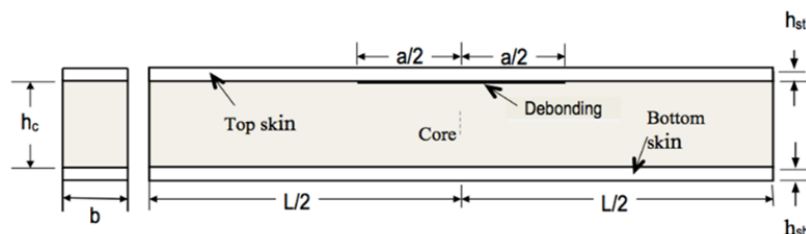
Cross section and longitudinal section of the 3m sandwich beam with a central Debonding
